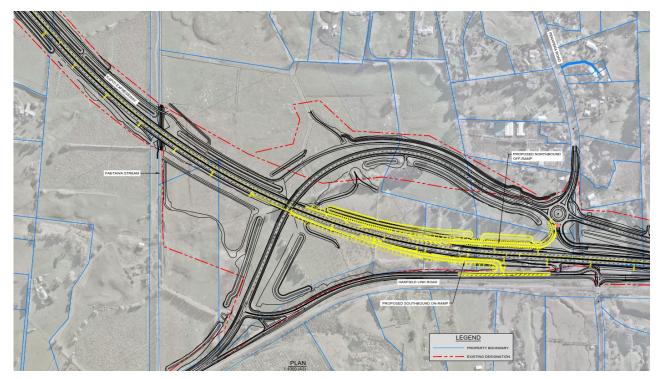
Plan illustrating the layout of Option 2, proposing two new ramps (in yellow) in addition to the existing roading network (in black)
